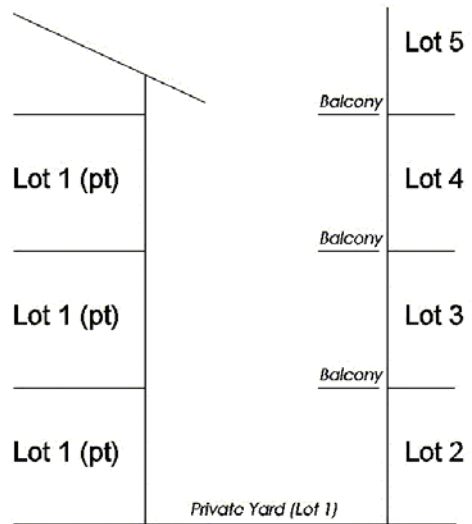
Private Yard unacceptable. Lots in building do not satisfy a low rise building.
